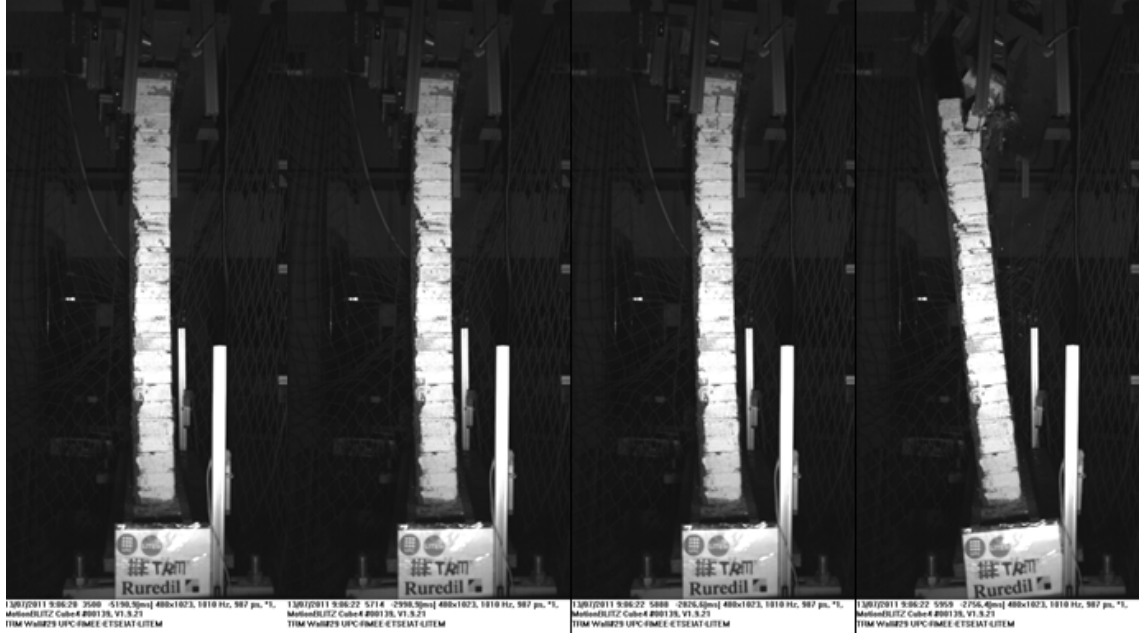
240 Failure of the wall W#28. Masonry failure at wall's top.
